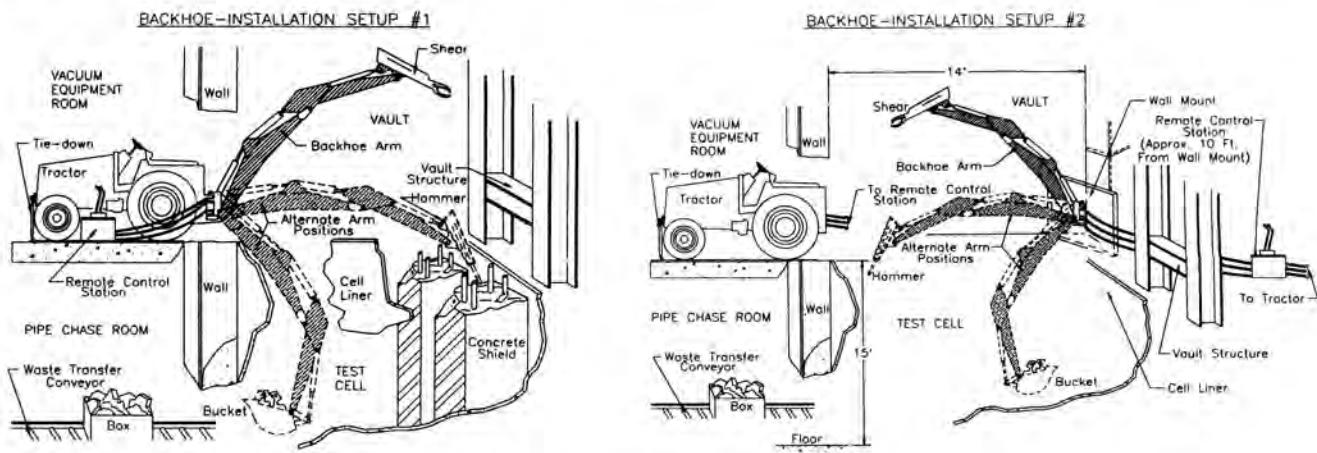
Backhoe installation for concrete removal: 1) tractor mount and 2) wall mount.
